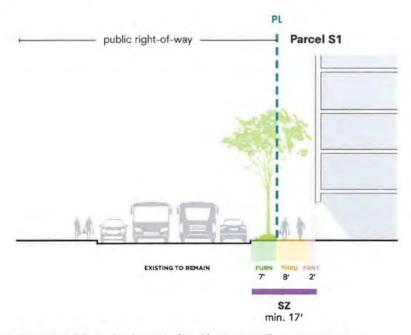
Buckingham Way (South) segment A illustrative section
